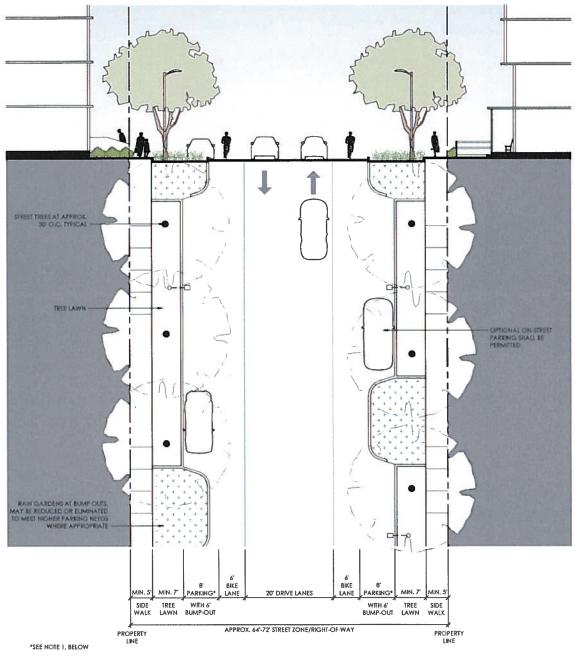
b: Retail Main Street - Parkway Alternative
